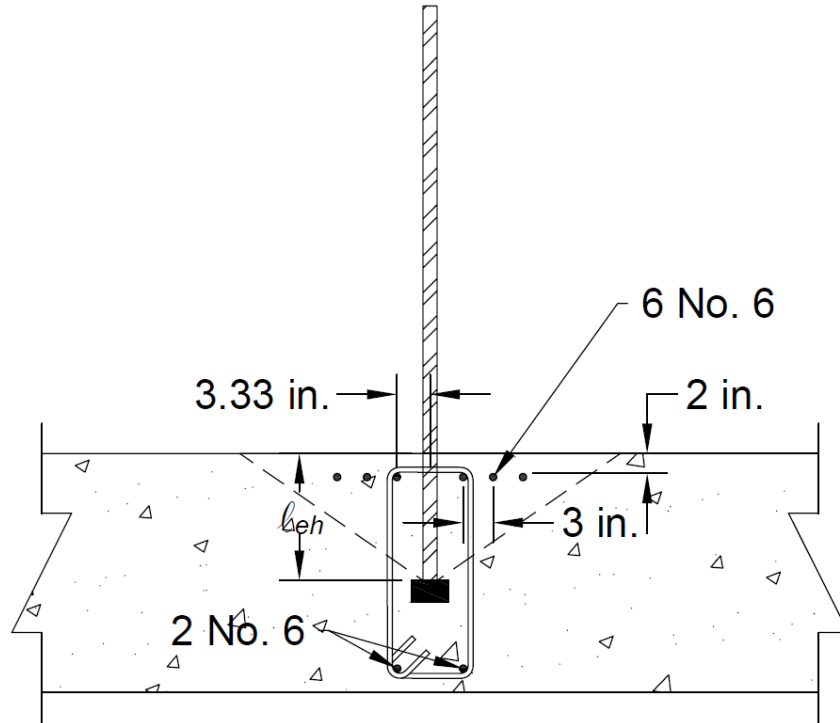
Cross-section view of slab specimen 11-5-S5.5-6#6-2#4-12.75 with parallel ties
